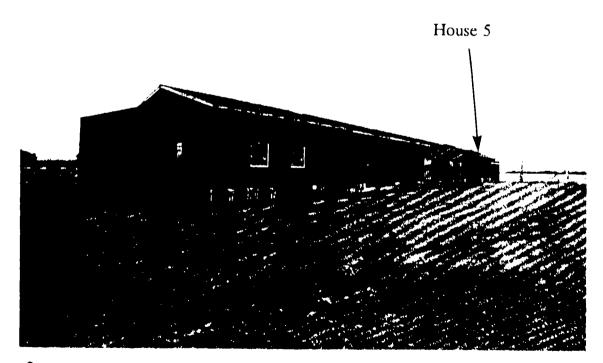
South side of test houses looking east along row from Masonry Unit 1.
